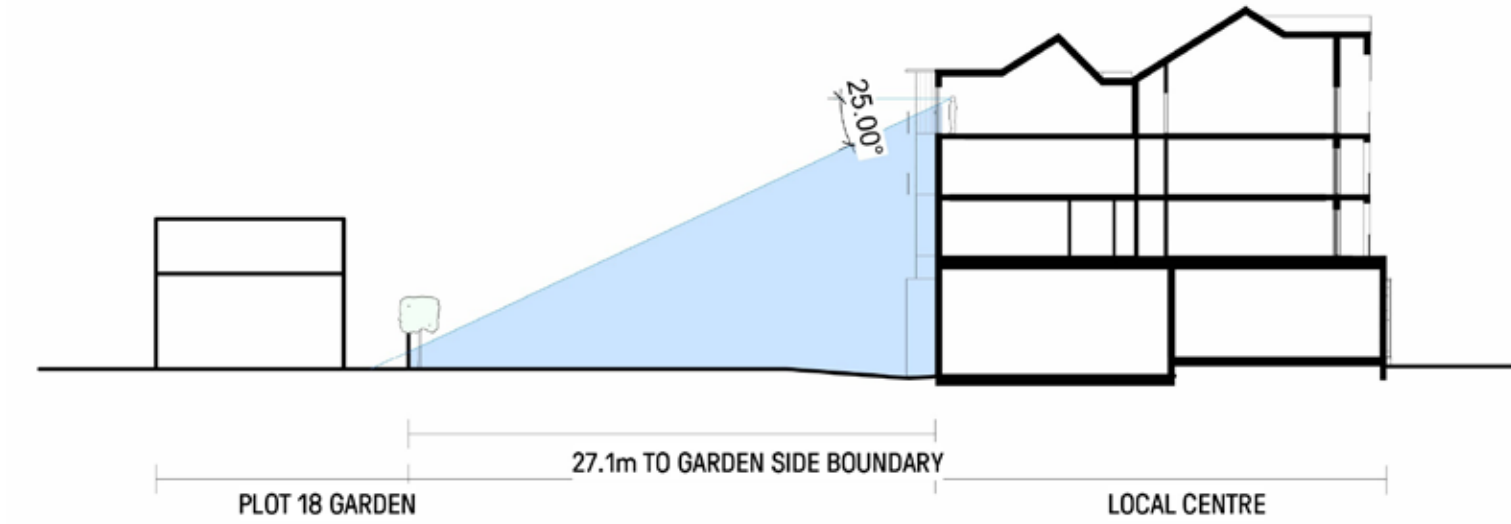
Local Centre & Plot 18 Third Floor Privacy Section prepared for Design Workshop
